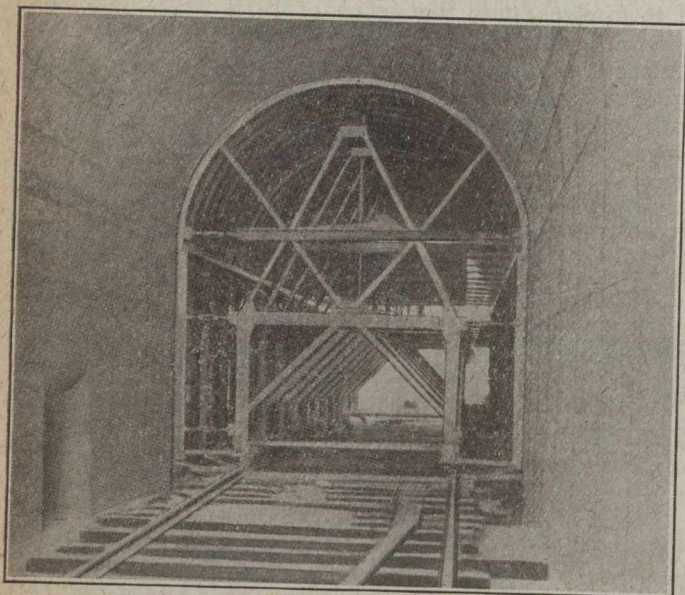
Showing Collapsible Steel Form Used in Filling Culvert
